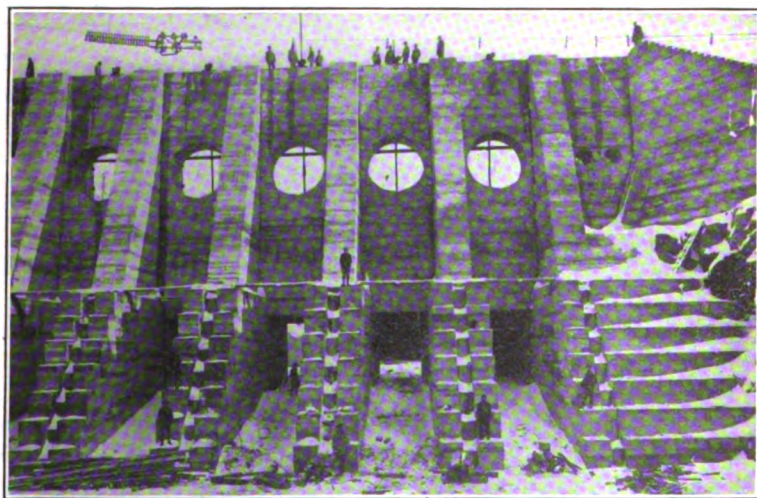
Concrete structure in diversion channel, Minidoka dam.
